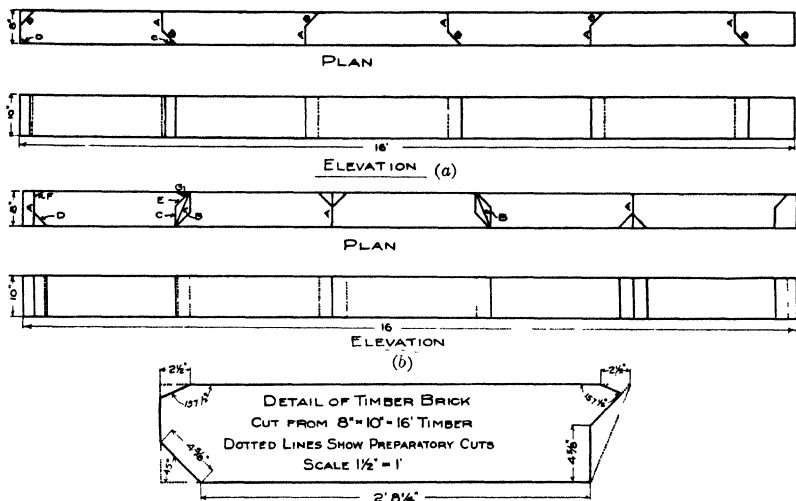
DETAILS OF FRAMING FOR SHAFT.
